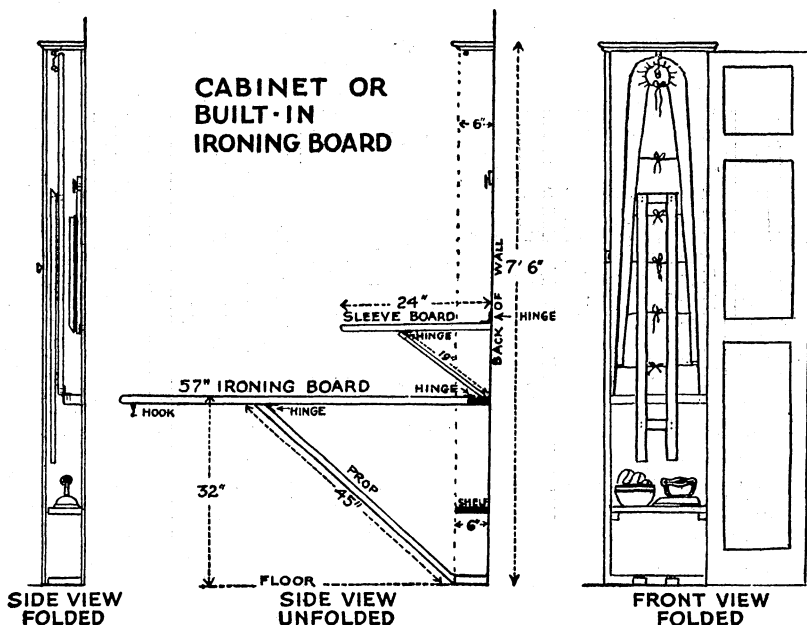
Detailed construction of a folding ironing board and its wall case
